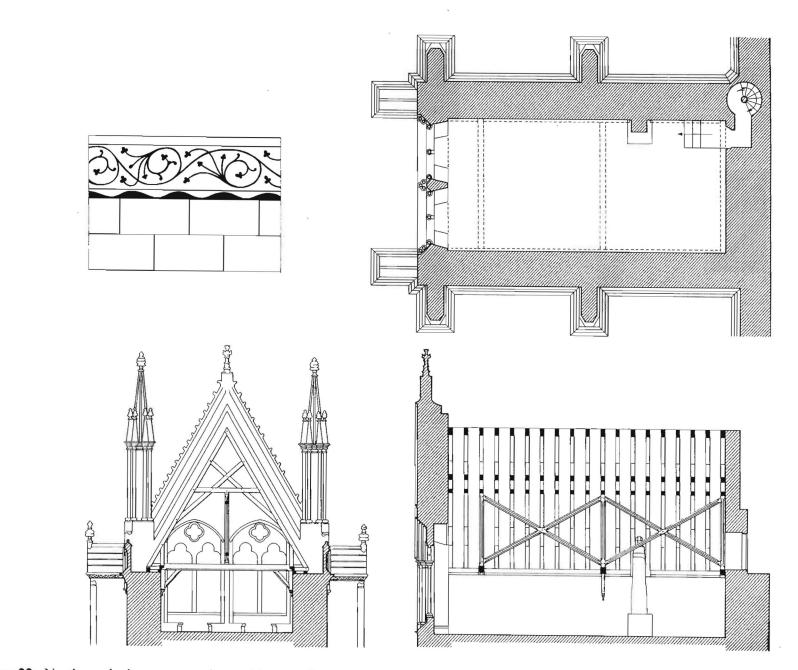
North porch plan, cross-section, and long section (N Fradgley, RCHME unpubl)
